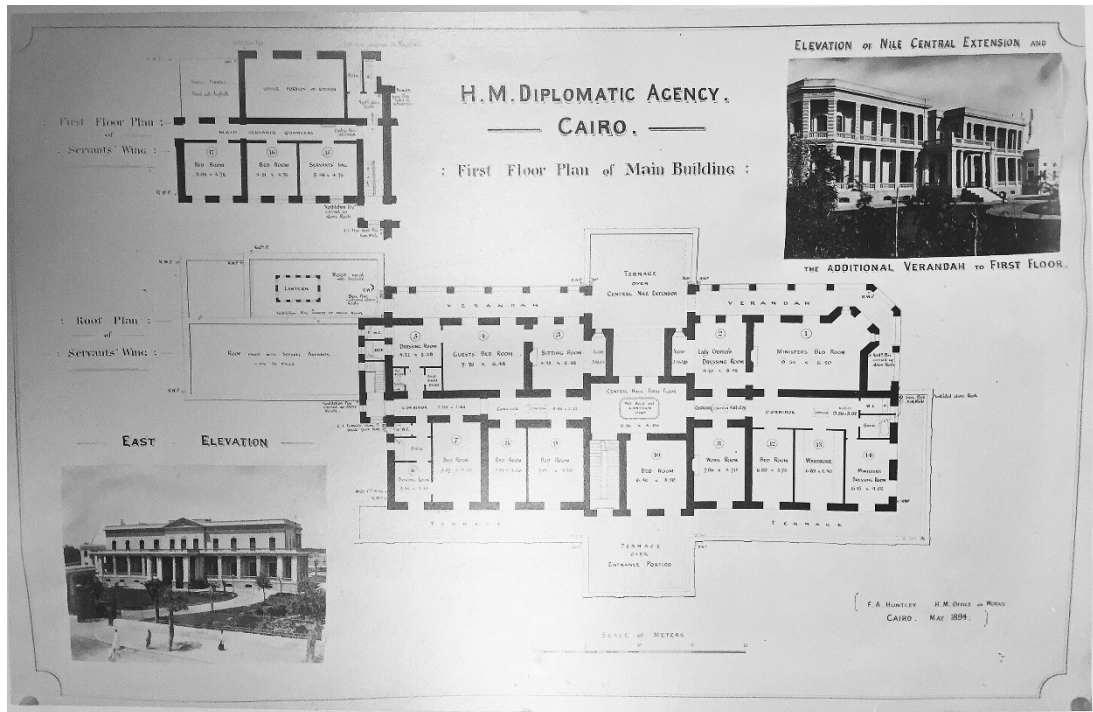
First floor plan of main building, British National Archives, WORK 40/469.
